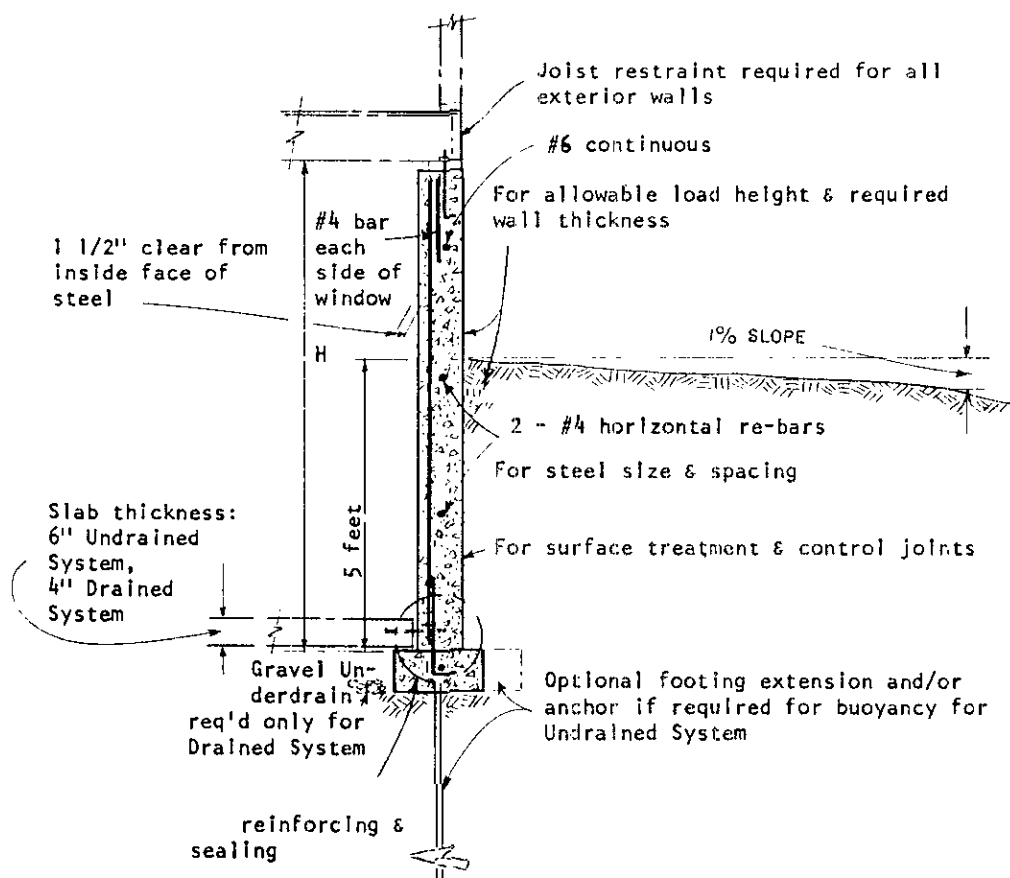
Reinforced concrete wall design. (Reference 26).
